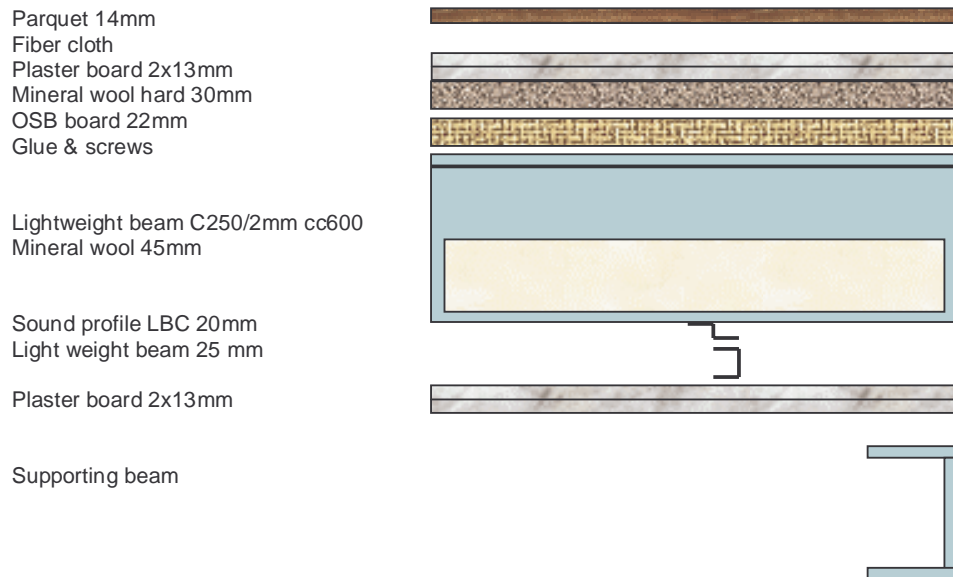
The composition of the lightweight steel floor that was tested. The total floor height is 415 mm.
